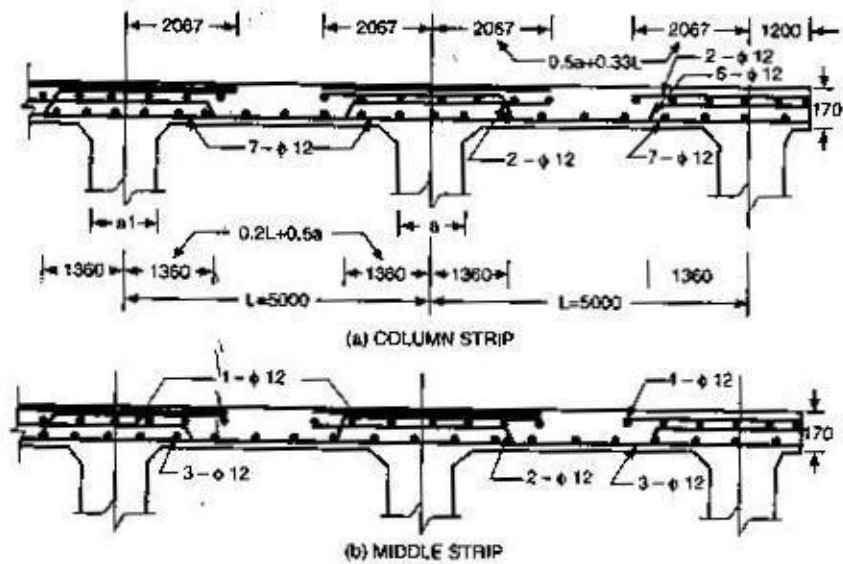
Reinforcement Details of Flat Slab of Example 10.7.
